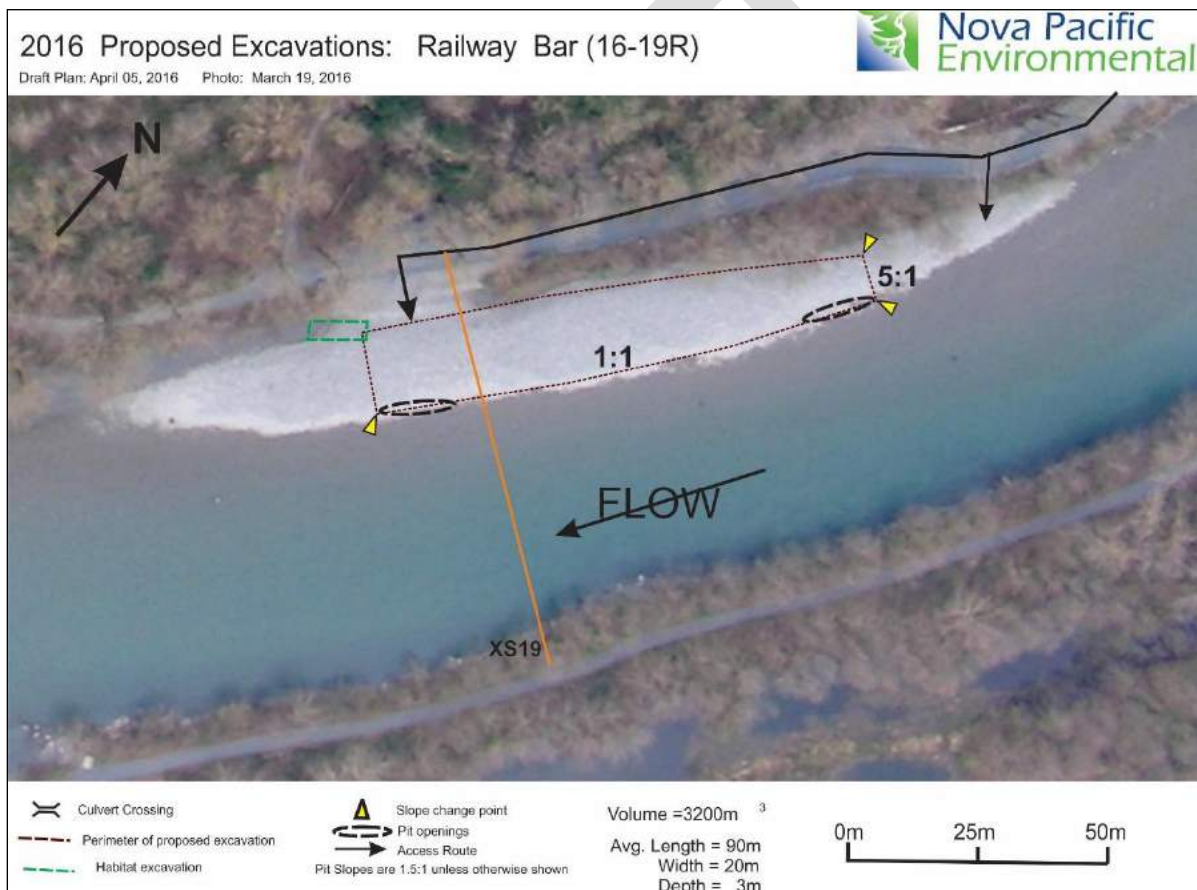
Layout of 2016 Railway Bar (16-19R) sediment removal project. Photo taken March 19, 2016, draft plan – April 5, 2016.
